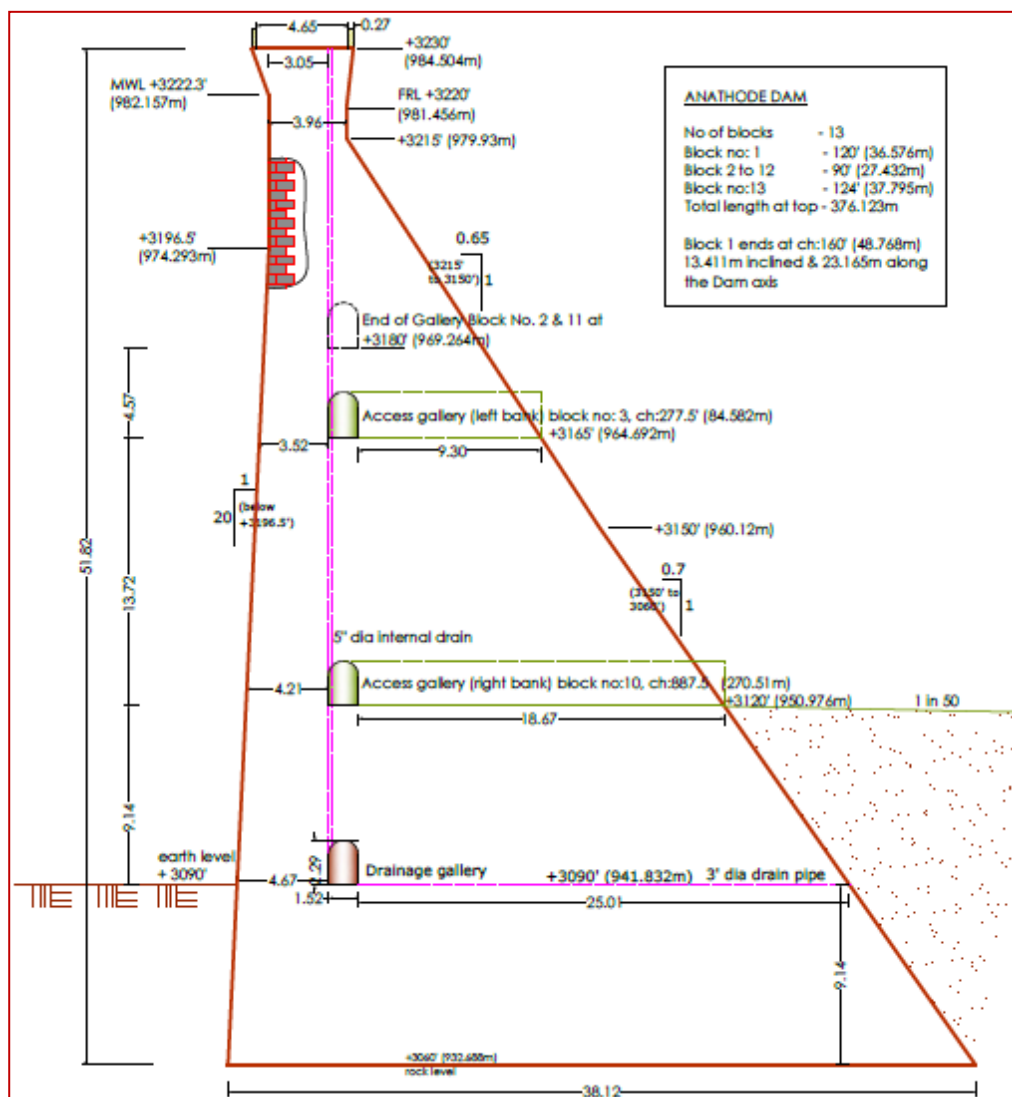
Cross-Sectional Elevation of Anathodu Dam
